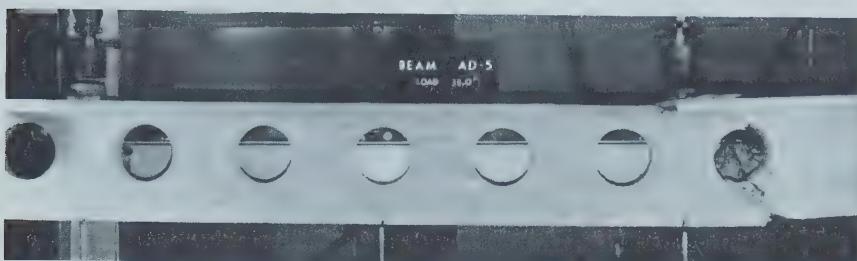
BEAM AD-5 CRACKING AND FAILURE PATTERNS
